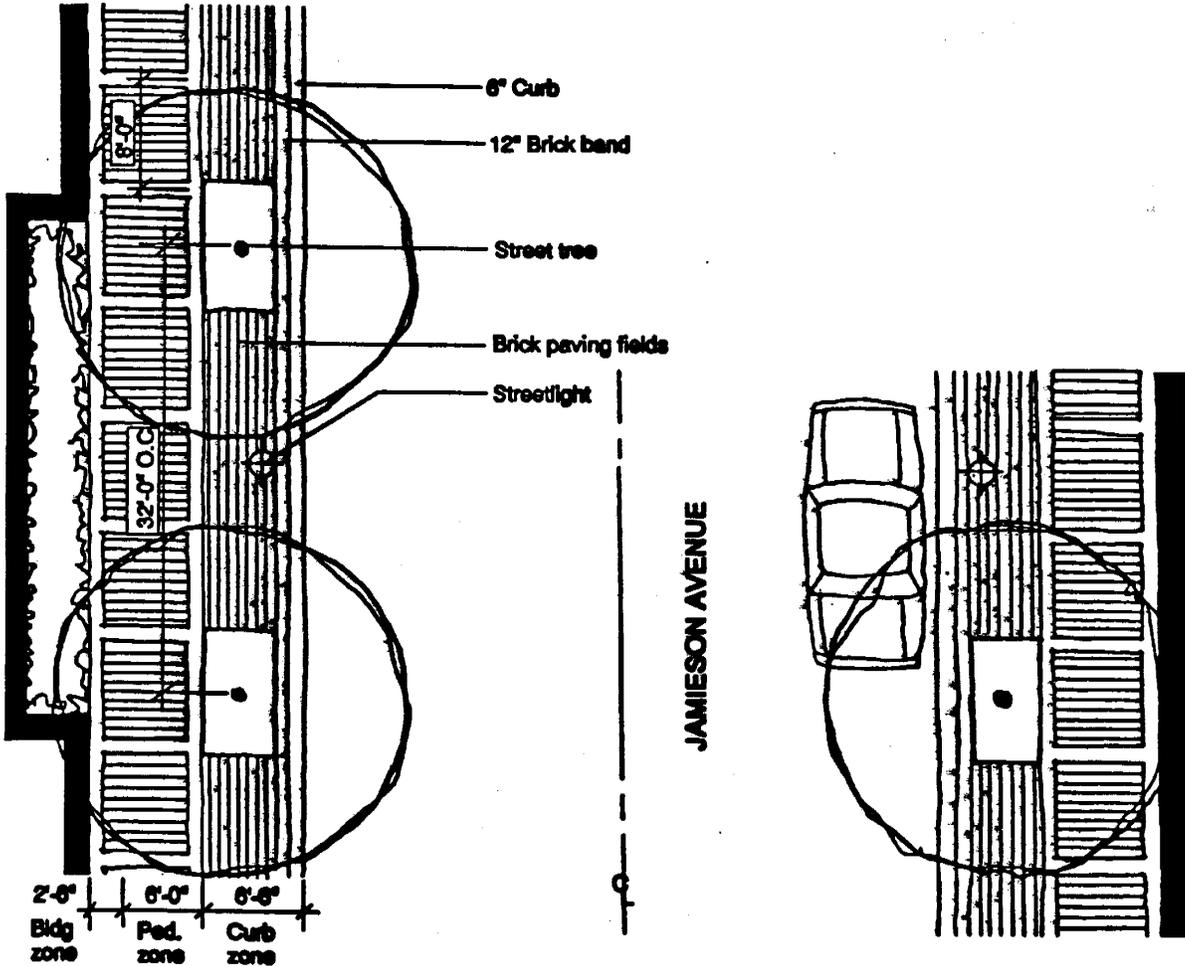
Jamieson Avenue - Typical Streetscape Layout
